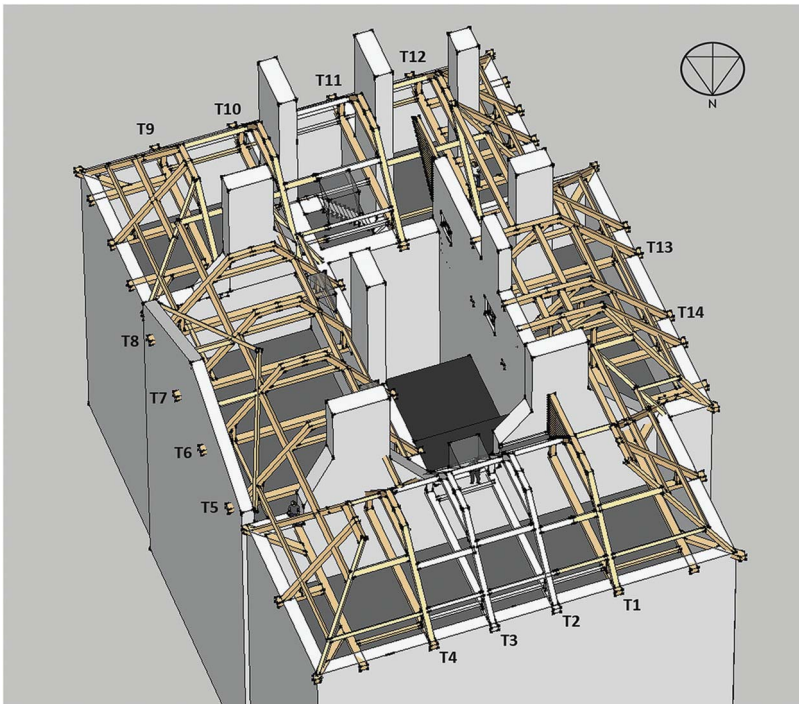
Moor Park: reconstruction of the roof: north-east view. Existing structure coloured; presumed structure in outline. *Survey:* Paul Drury. *Drawing:* David Wrightson
